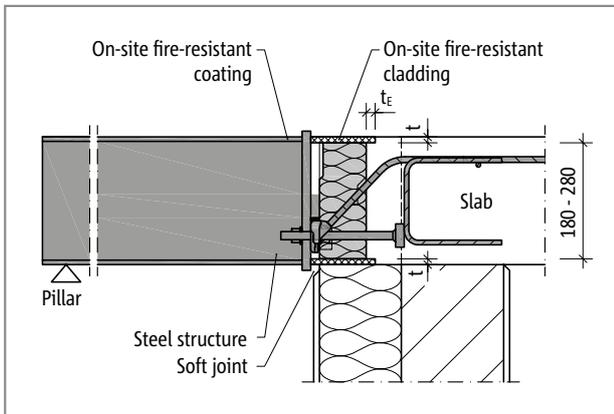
Schöck Isokorb® T type SQ: on site fire-resistant cladding of the connection when using steel structures with fire-resistant coating; cross-section
